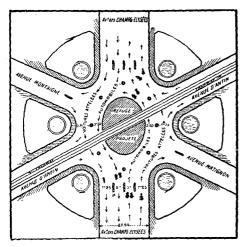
Plate IV.—Proposed plan for the Rond Point on the Avenue des Champs Elysées. This beavily traveled avenue should have its traffic in each direction divided into two streams, horse drawn and automobile. It is crossed by two other avenues, one of them having a street railway line. Safety zones around the ellipse serve to continue the separation of traffic and assist pedestrians
